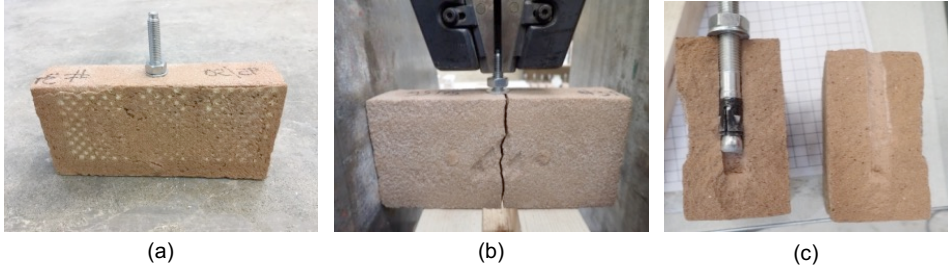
Example of specimen prepared for testing pull-out and shear strength of mechanical anchors in masonry: sample before (a) and after testing (b); specimen after removal from test setup (c). From [151].
